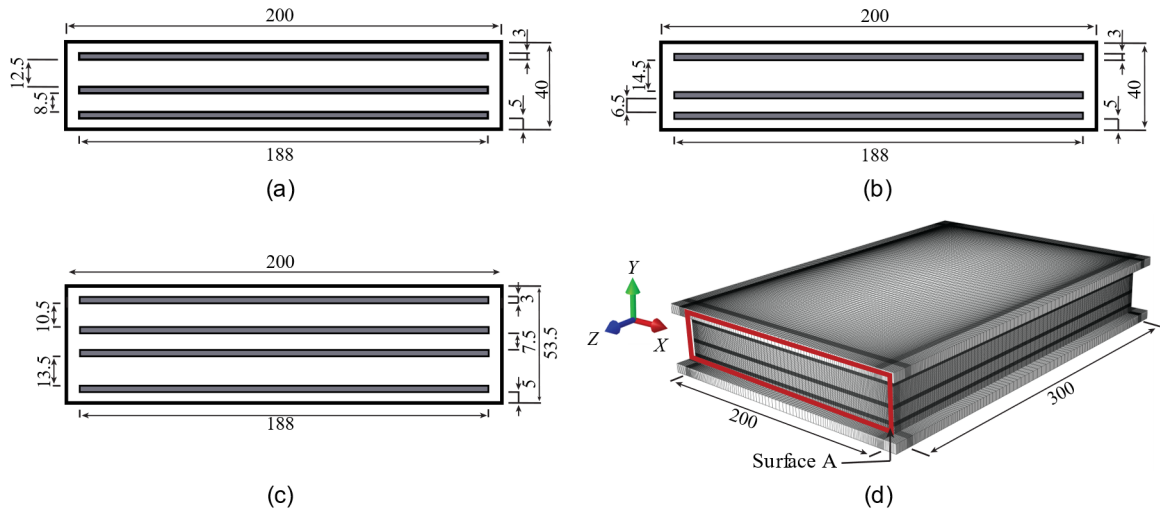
Geometry of the bearings (a) B1, (b) B2, and (c) B3 and (d) finite element mesh of bearing B1 and top and bottom plates (all dimensions in mm)
